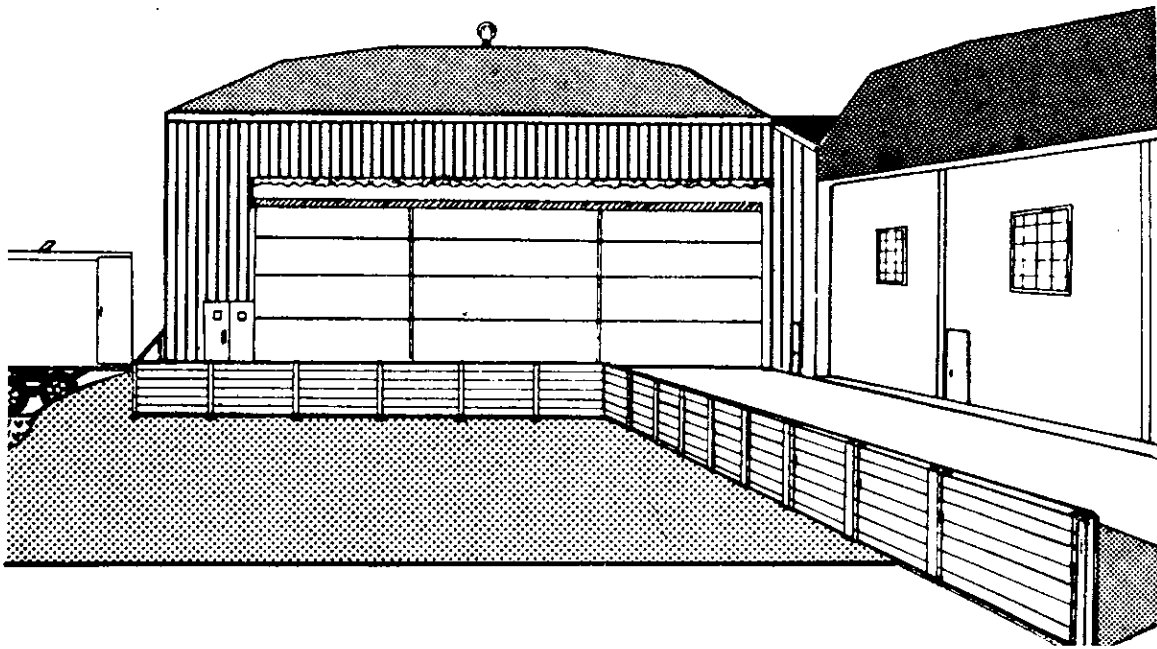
Low outdoors walls as a flood shield for large openings. (Reference 12)
